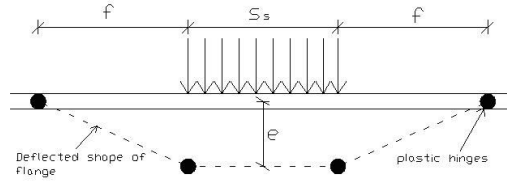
Flange mechanism under patch loading failure, from [5].
